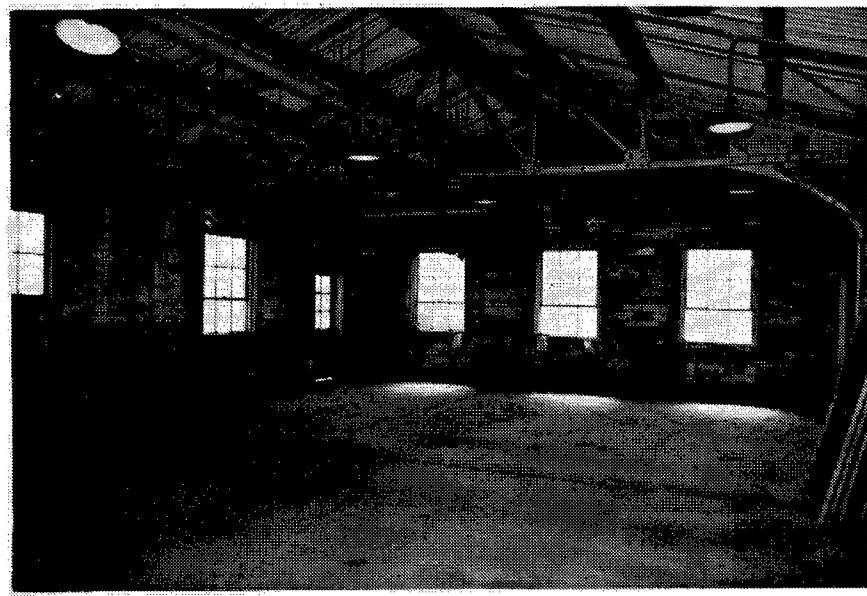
Building 2B-9: Interior view of a Primer Dry House.
